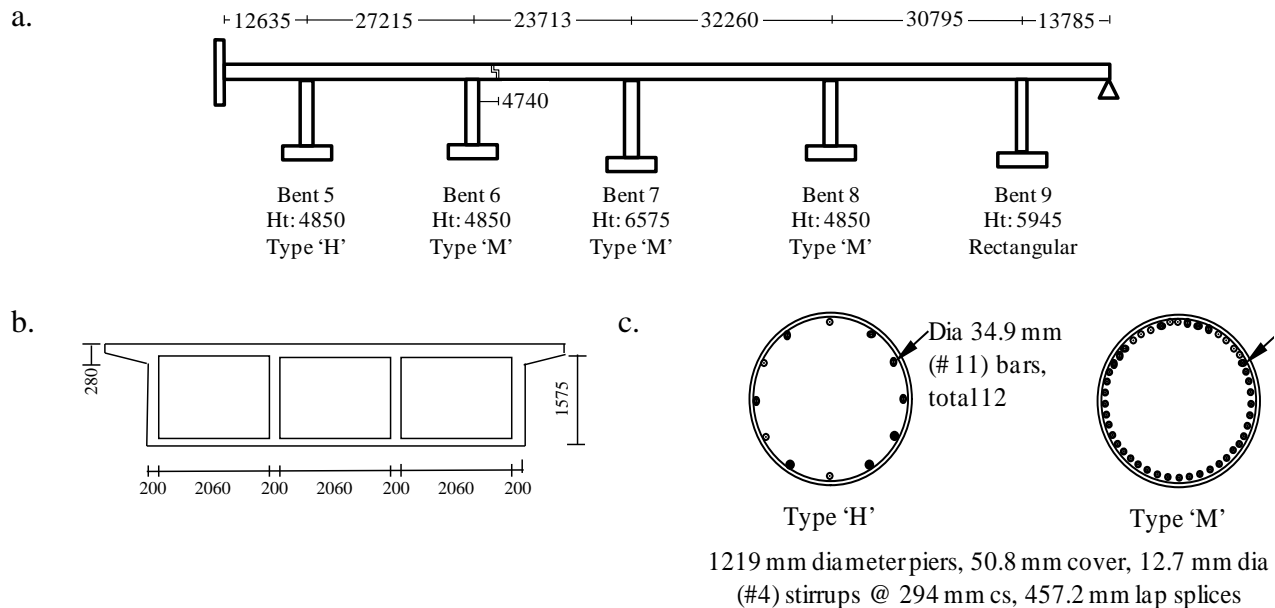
(a) The testbed bridge (schematic), (b) cross-section of bridge girder, and (c) cross-sections of type ‘H’ and ‘M’ piers (all units are in mm)
